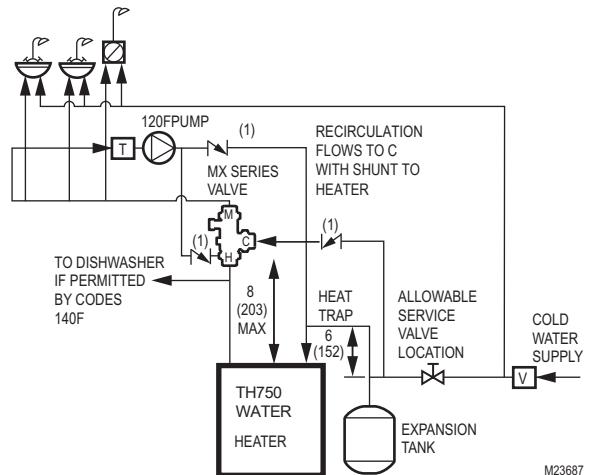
Heater with recirculation. Dimensions shown in in. (mm).
